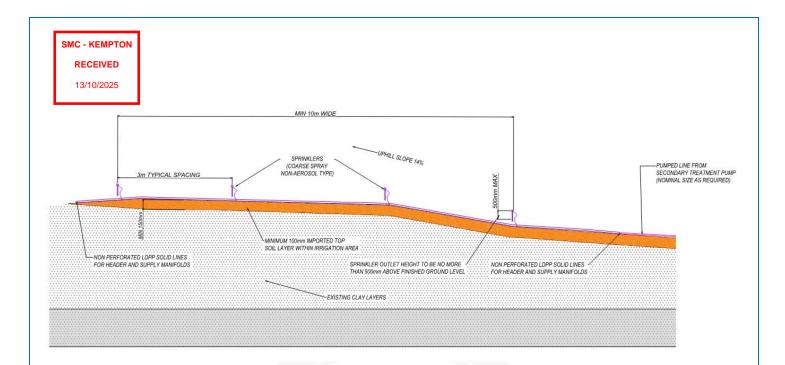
RECOMENDED IRRIGATION CROSS SECTION DETAIL
